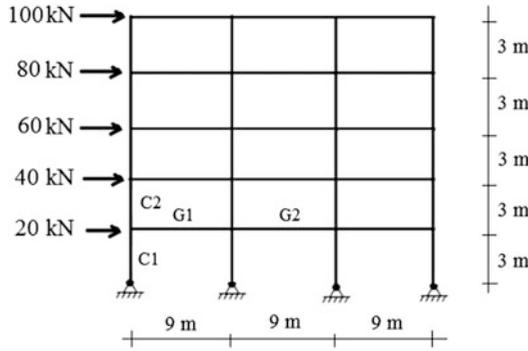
Earthquake in N–S direction—specified floor loads on a typical frame
